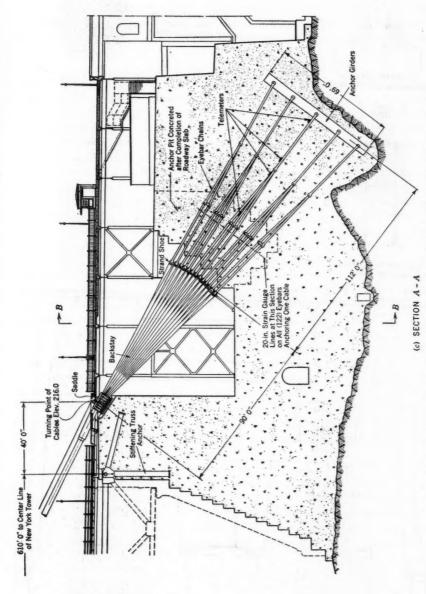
LONGITUDINAL SECTION A.4, NEW YORK ANCHORAGE (SEE, ALSO, FIGS. 4 AND 6).
